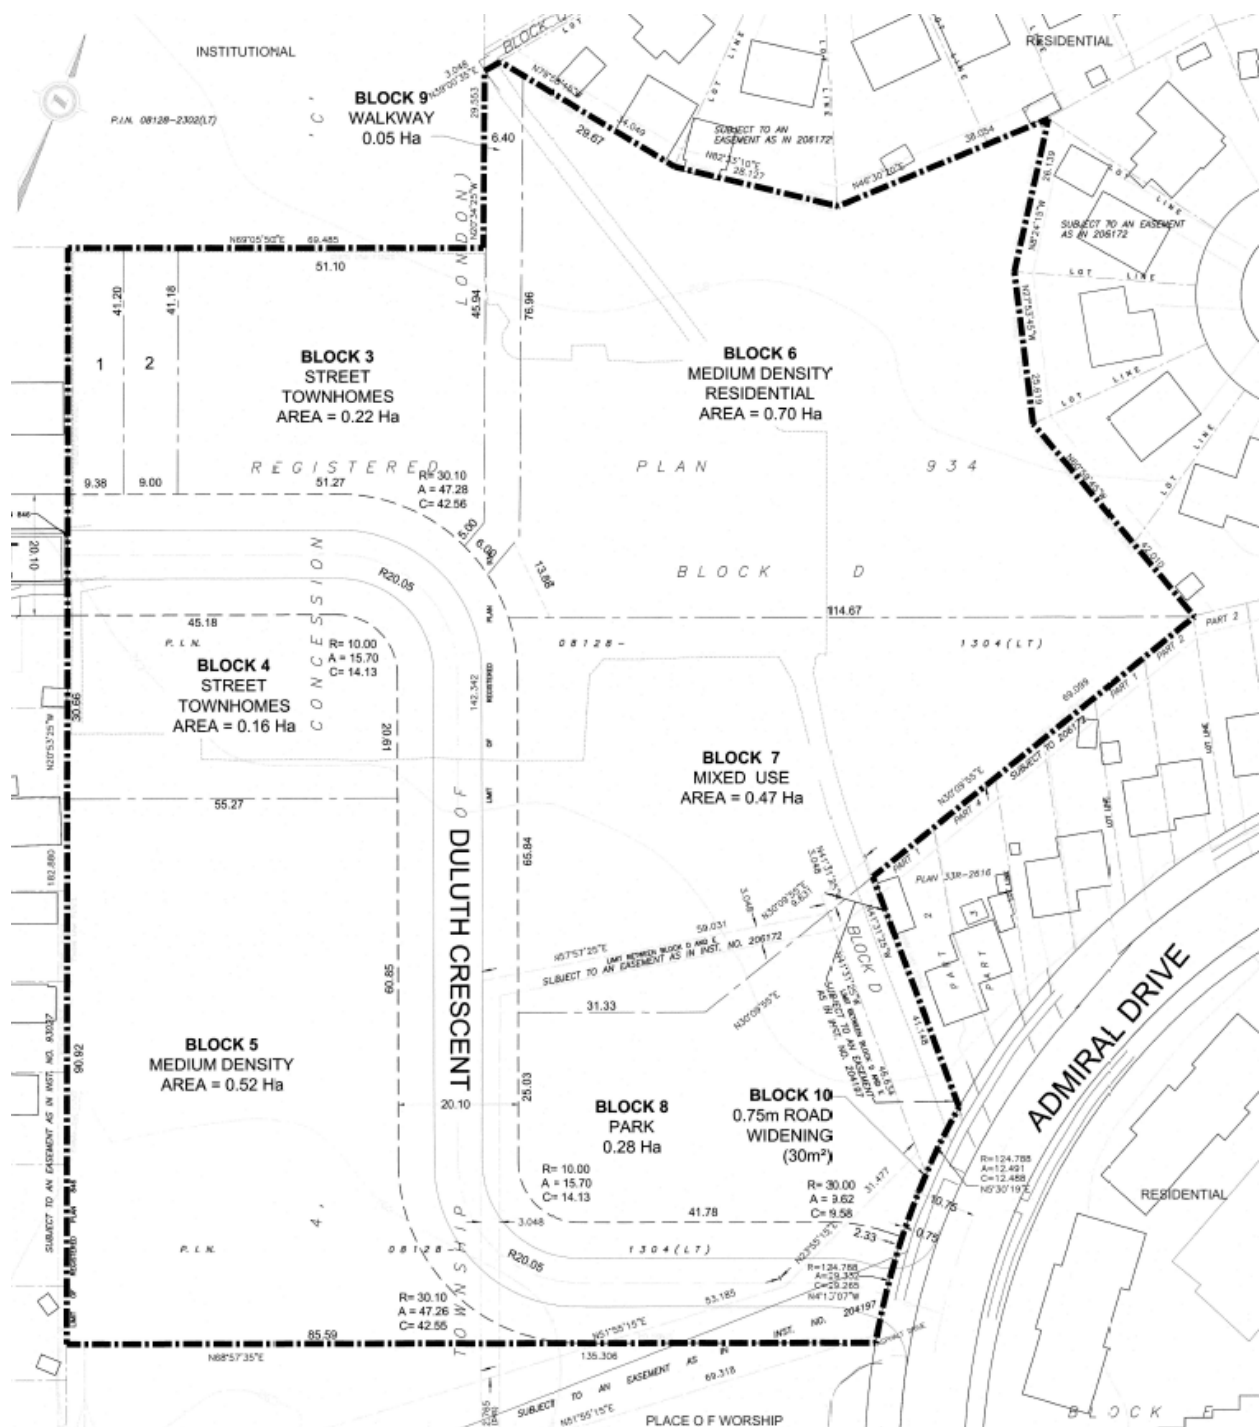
Excerpt from Proposed Draft Plan (MBPC, 2023)
